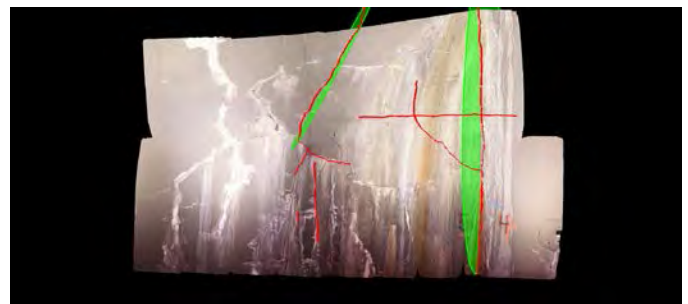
Clean air supply duct, south-west ventilation building, view of south lining wall from within duct with digitized features.
